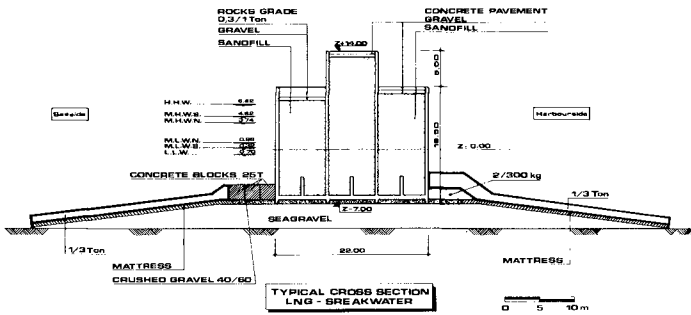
Development of design : caisson type breakwater (typical section at LNG-breakwater site)
